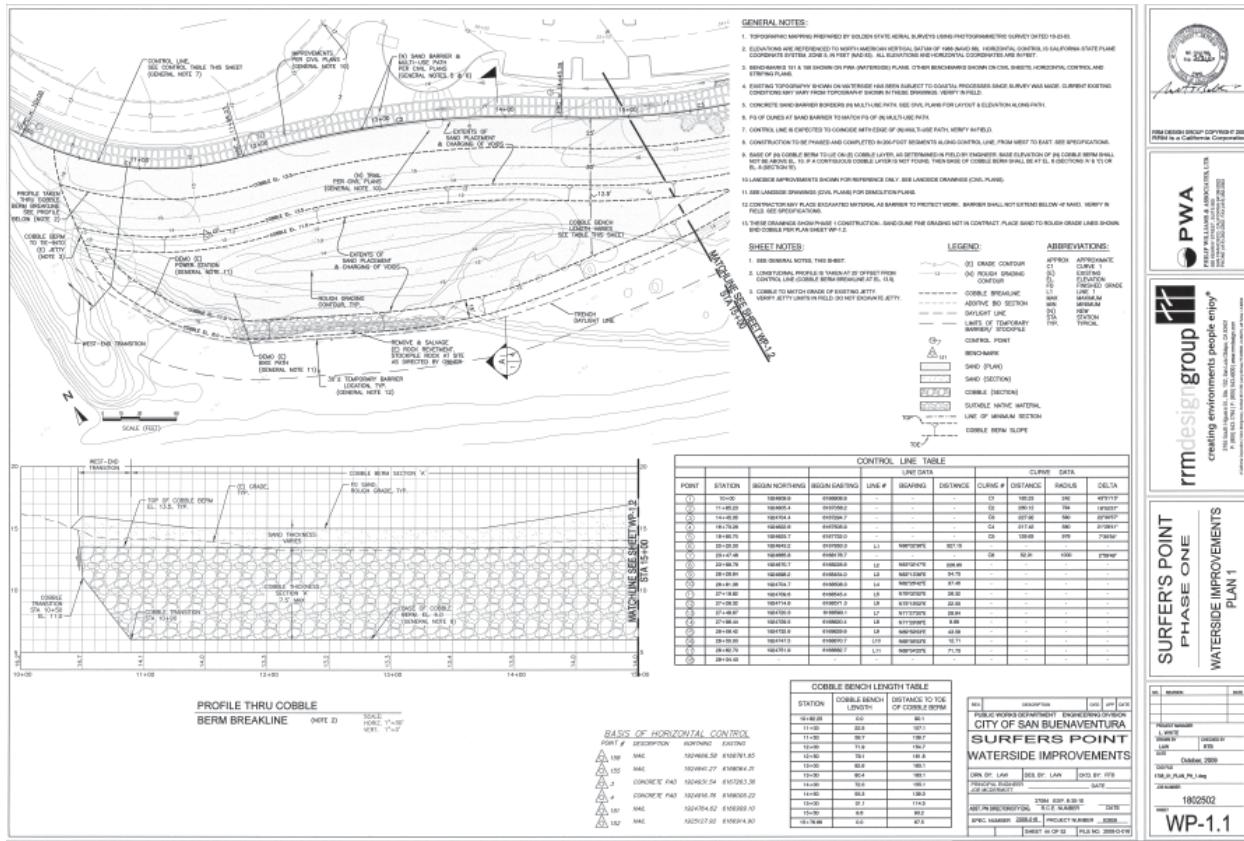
Plan and typical section of water side design. Source: PWA, 2010.
